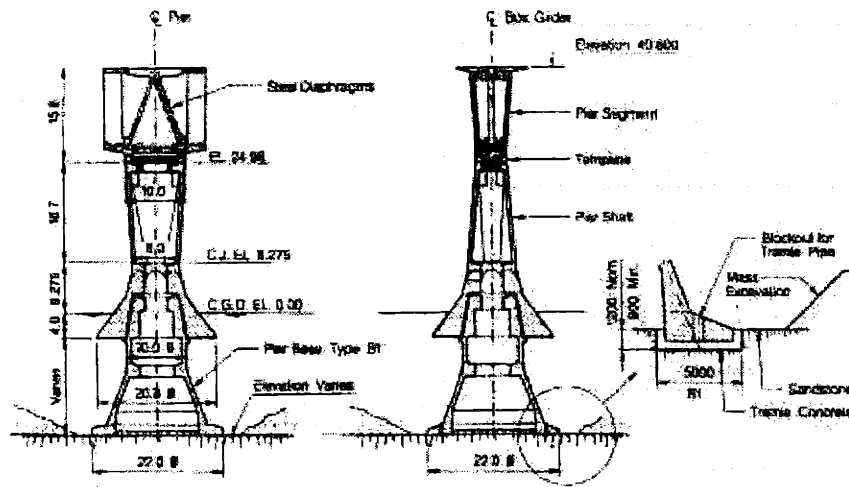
Main Bridge Typical Pier - Longitudinal Section, Transverse Section and Detail.
